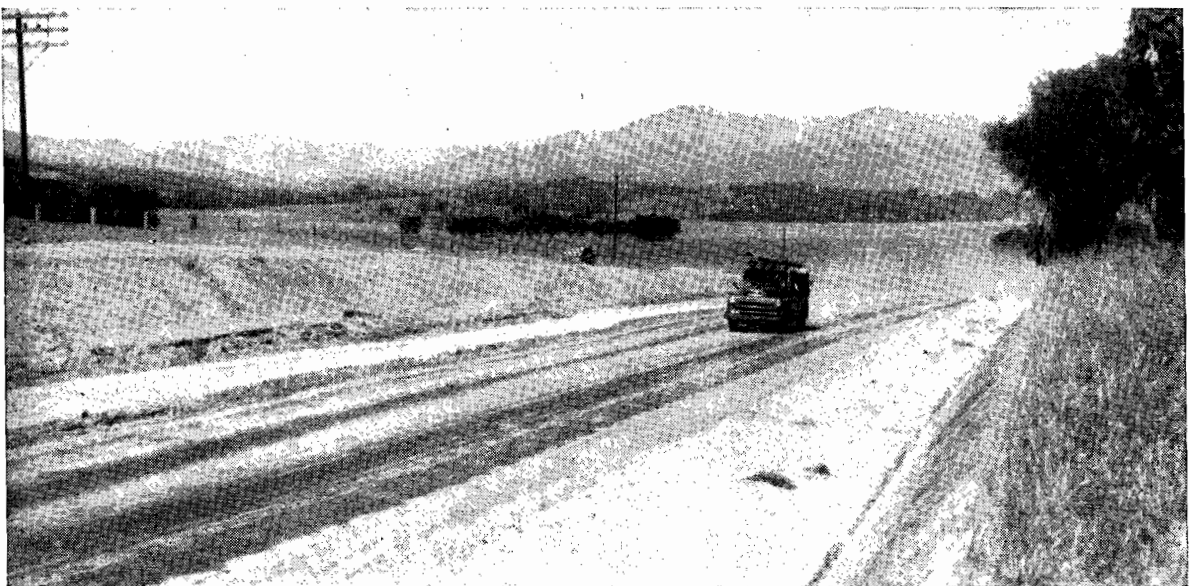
A widened section of Maroondah Highway, north-east of Coldstream.
